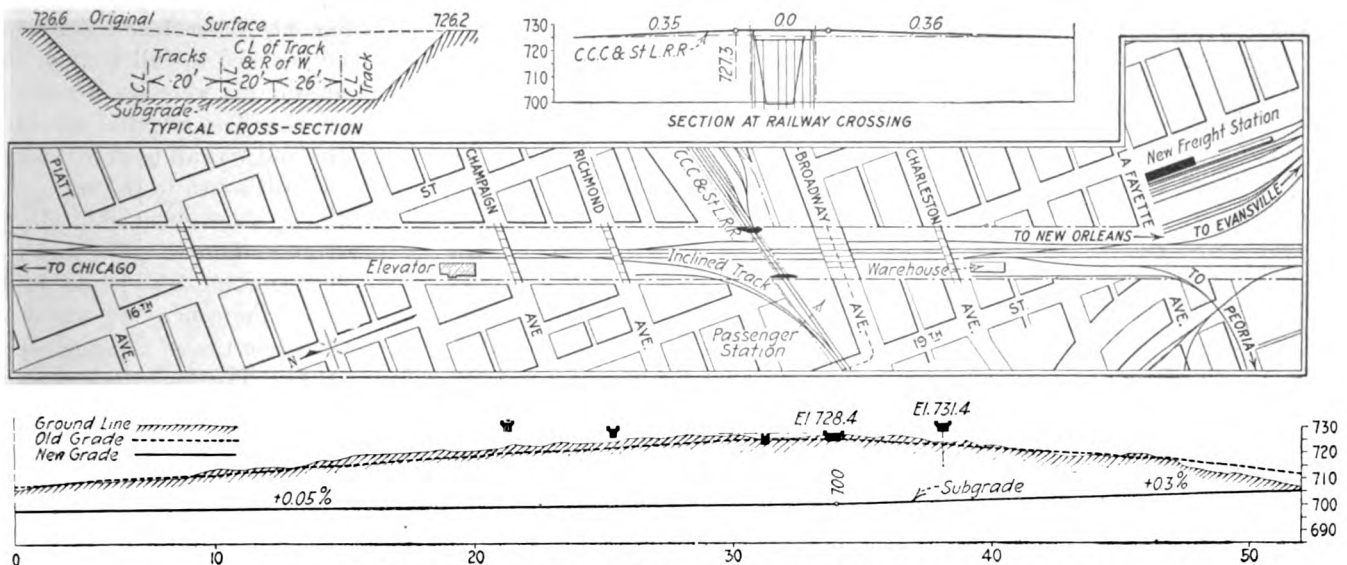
PLAN AND PROFILE OF TRACK DEPRESSION AT MATTOON, ILL.
